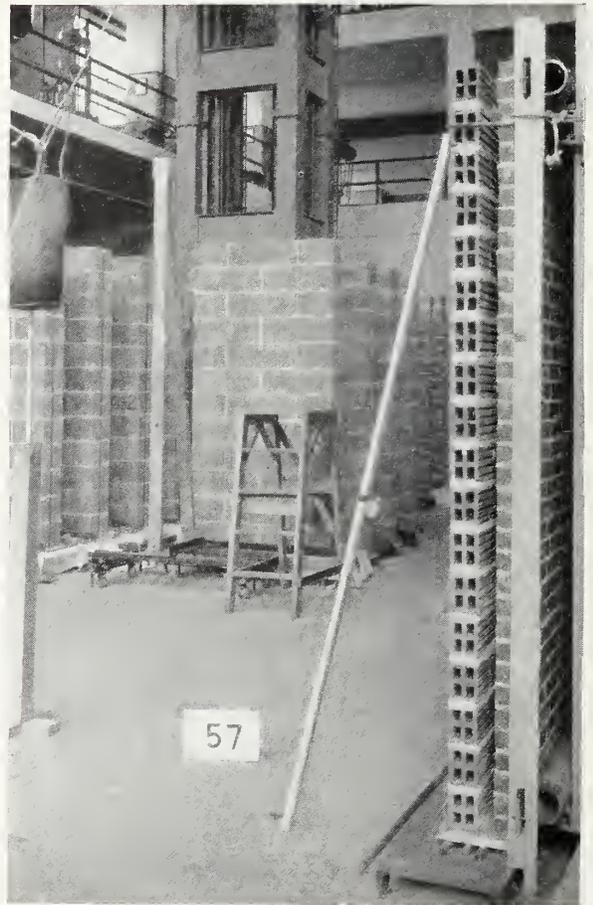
Concentrated load on wall AU, load applied to outside face.
